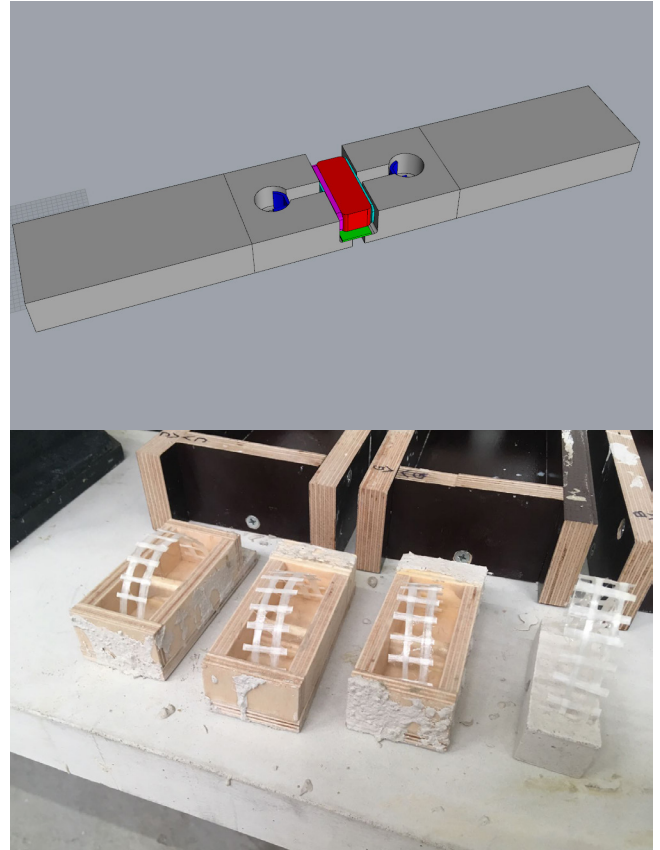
Formwork concrete blocks (Peter Eigenraam, 2018)
